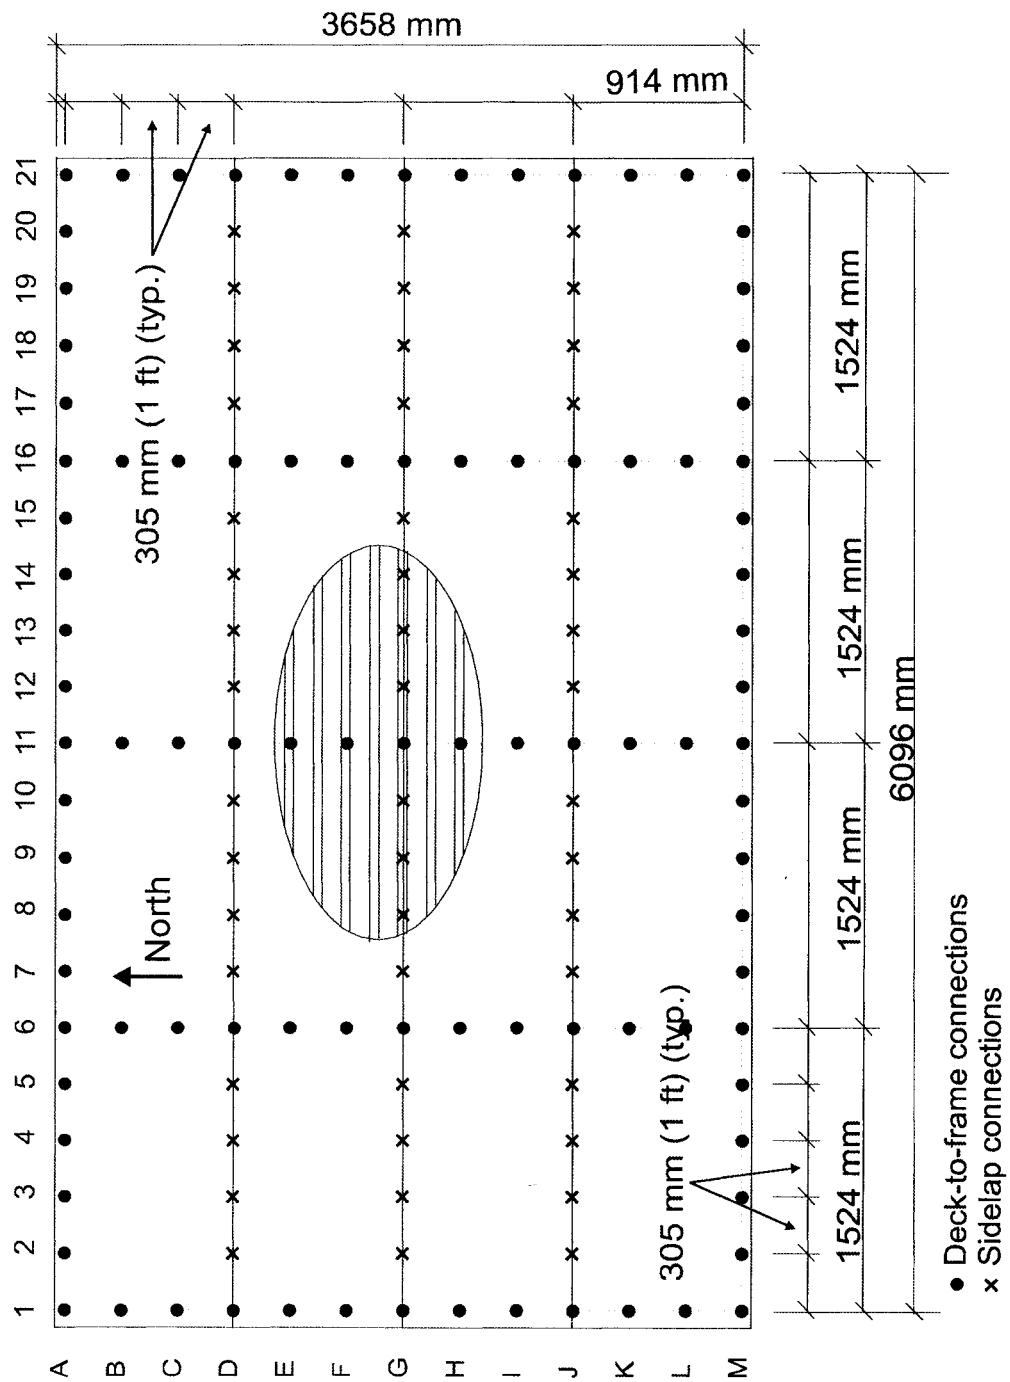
Layout of deck-to-frame and sidelap connections (305 mm c/c spacing)
